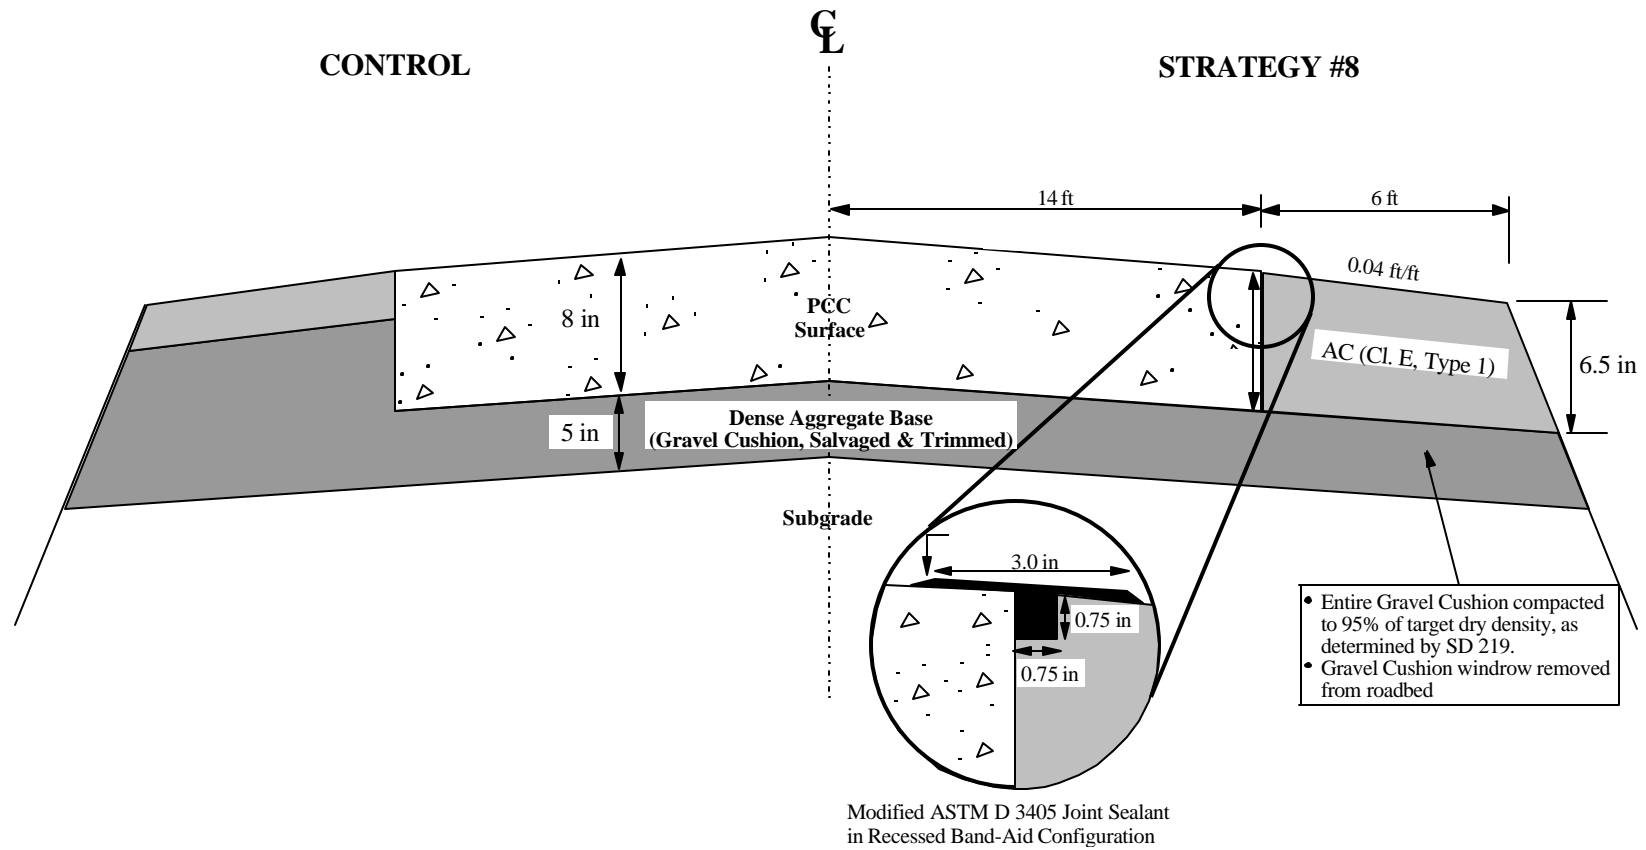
Cross-section of FDAC shoulder strategy (as viewed NB in replicate 1 and SB in replicate 2).
